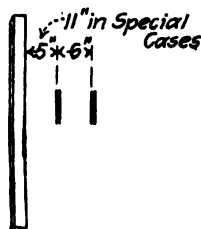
Method of Mounting of Direct-Current Busbars.
